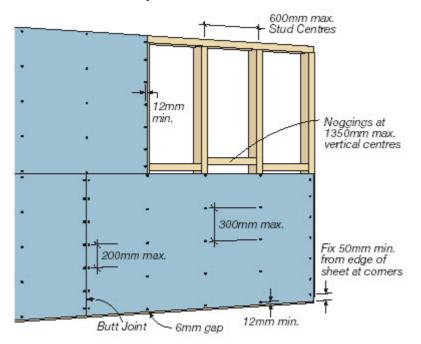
Wallboard installation. Fastener method non tiled areas.
